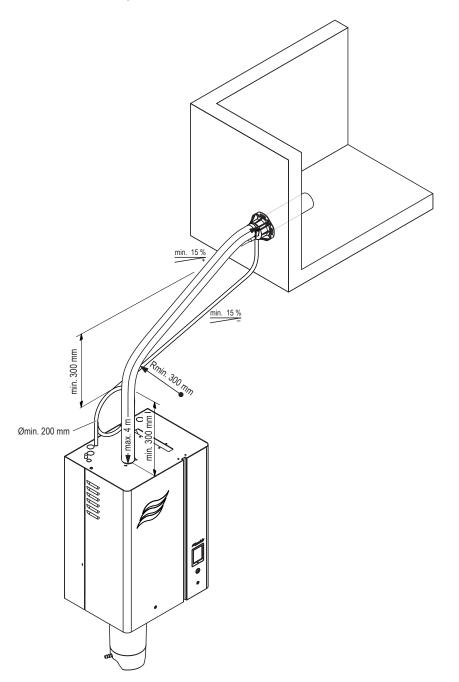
Steam distributor mounted more than 500 mm above the top edge of the steam generator
